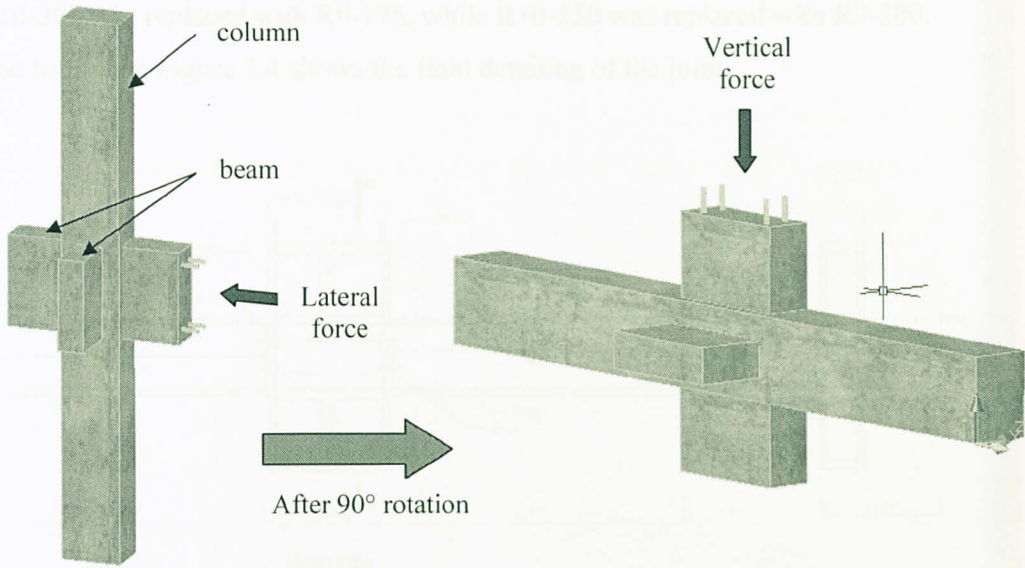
Proposed orientation of the beam-column joint for testing.
